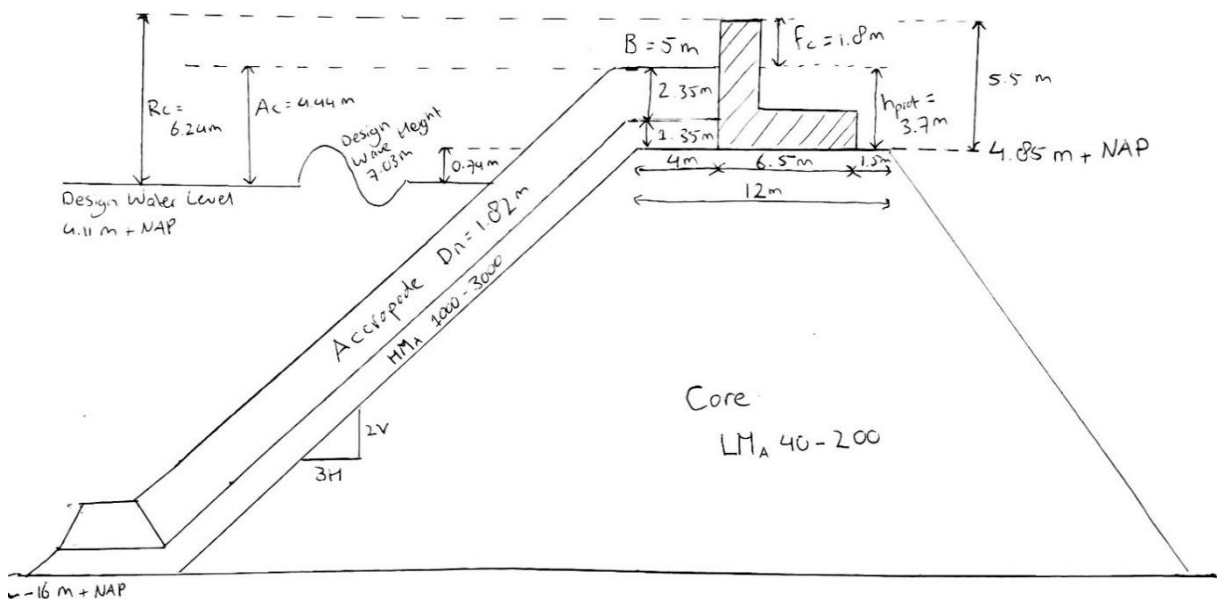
Cross-sectional design breakwater IJmuiden (first design proposal)
